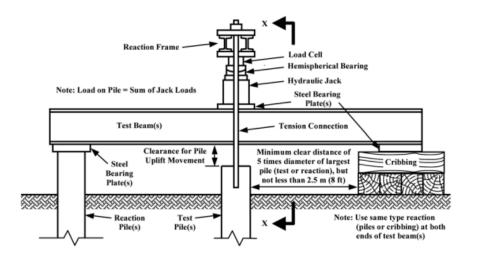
Typical Setup for Tensile Load Test Using Hydraulic Jack(s) Supported on Test Beams(ASTM : D3689 – 07)
